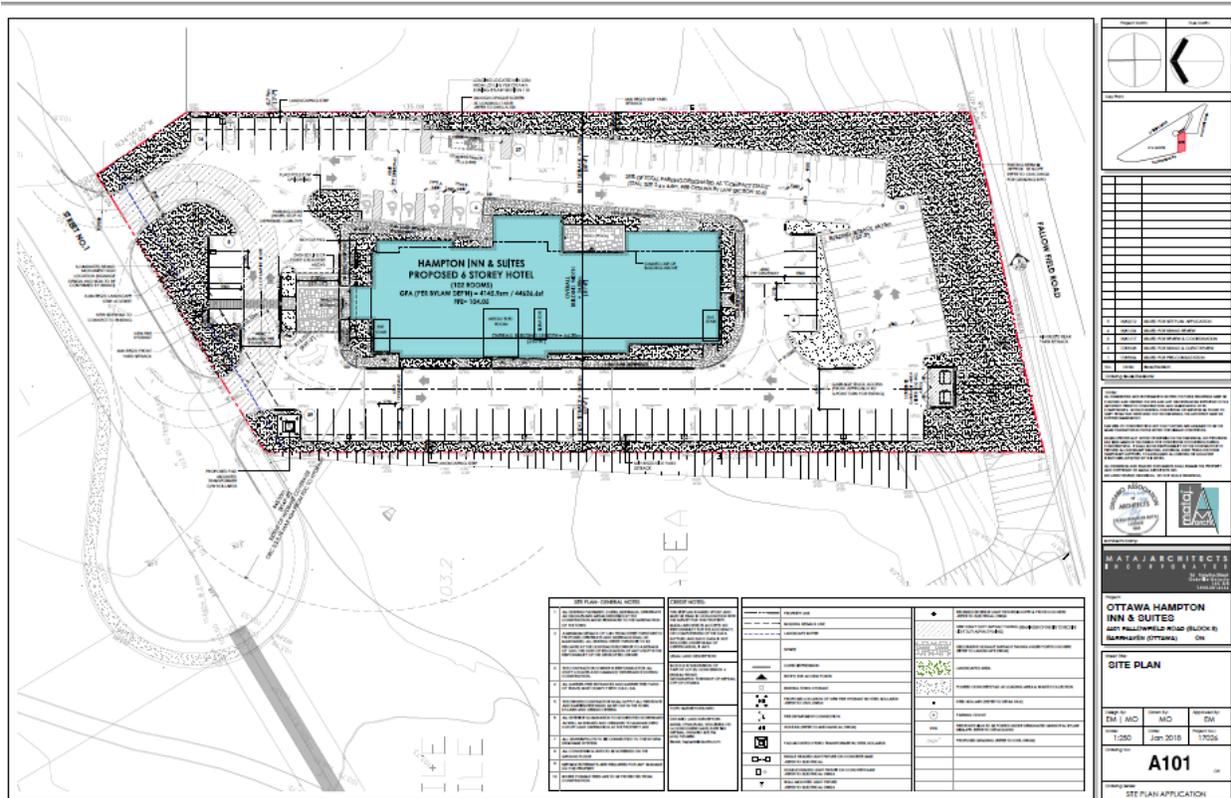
represents the site development concept plan for the proposed 6 storey Hampton Inn and Suites Hotel to be located on Block 8 of the draft approved plan of subdivision. The plan features a 6 storey (18.7m) height building having a gross hotel floor area space of 4021m² plus 124m² of meeting room area.
